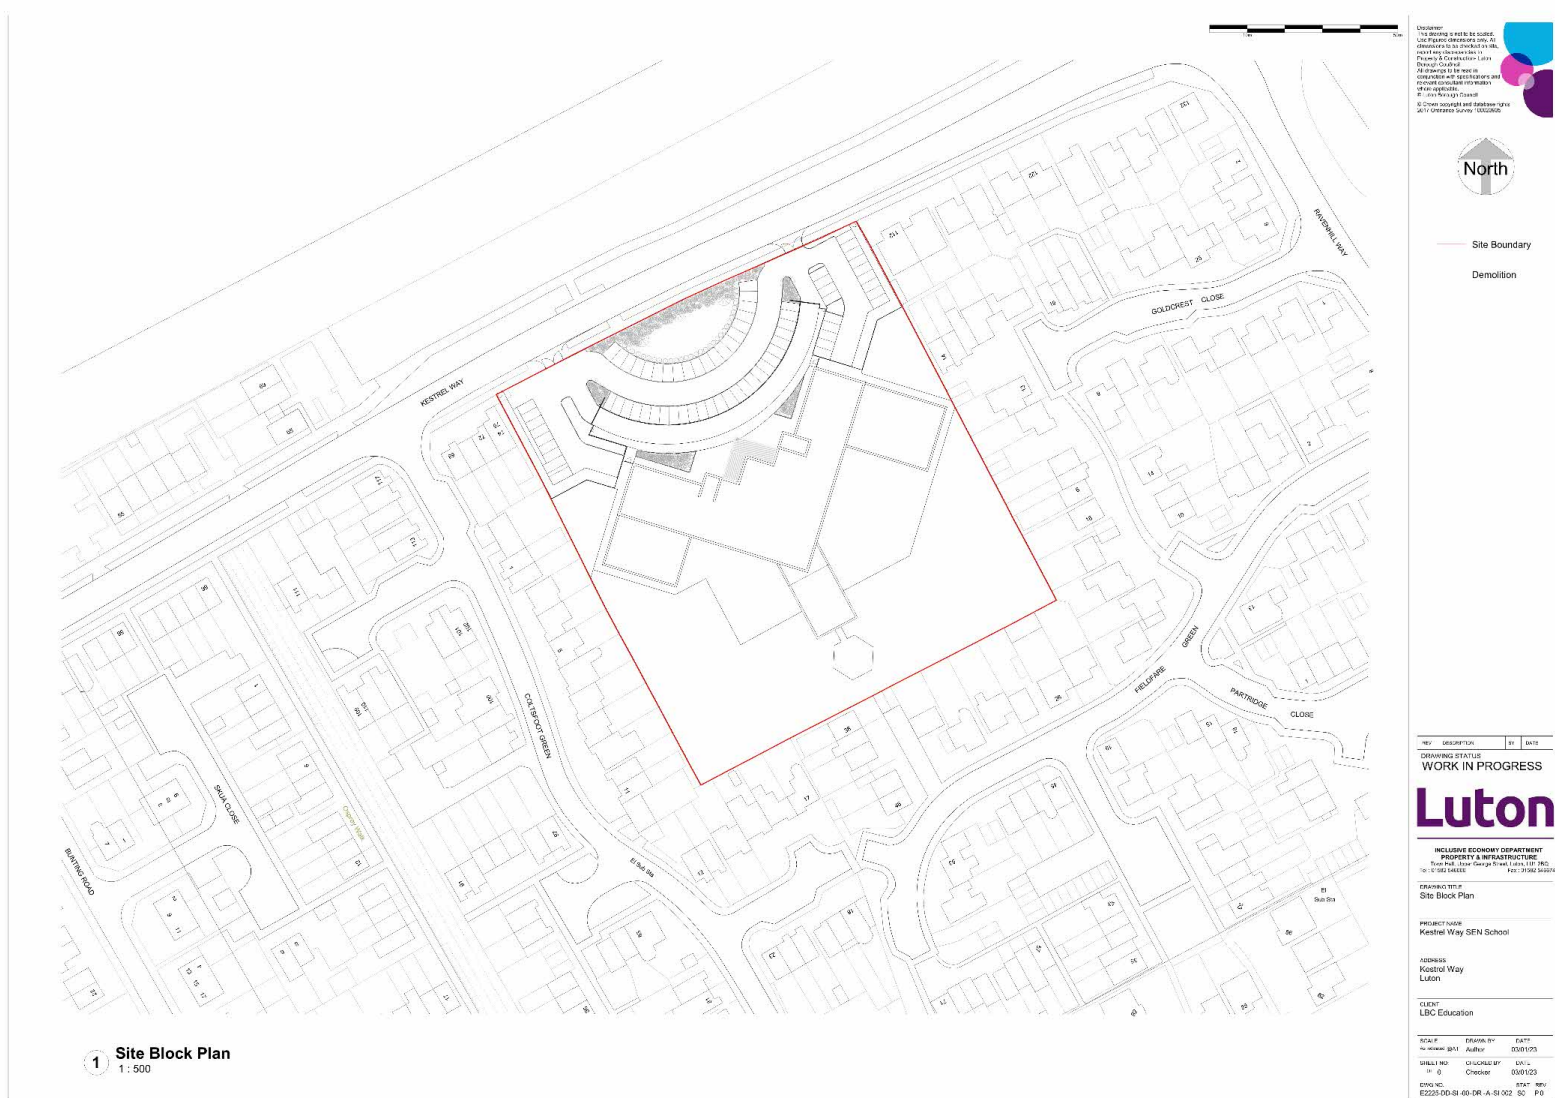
Proposed Development Plan (Drawing ref: E2225-DD-SI-00-DR-A-SE-002, dated 03/01/2023)
